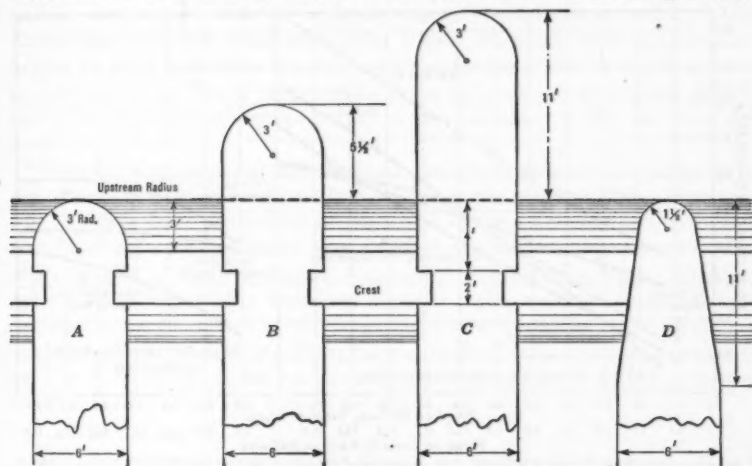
TYPES OF SPILLWAY PIER NOSES.
